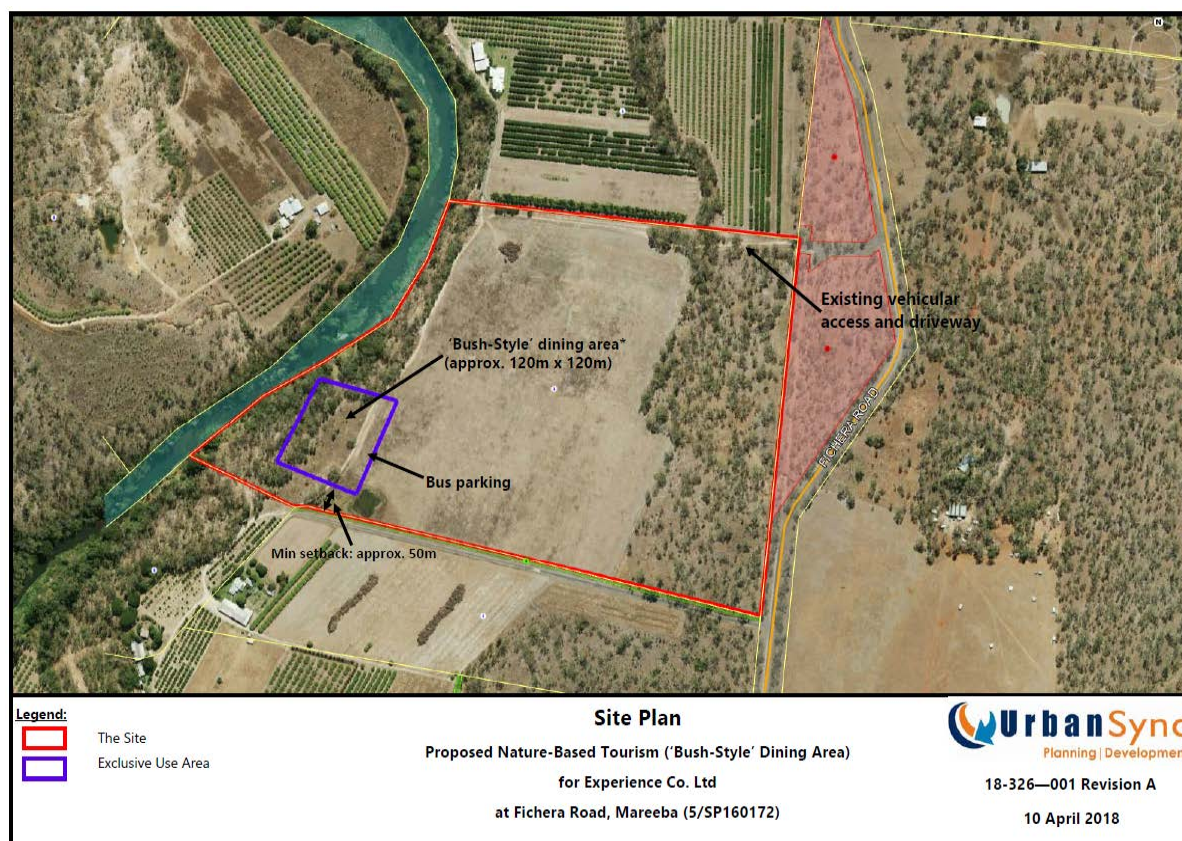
Site Plan – Proposed Nature-Based Tourism at Fichera Road, Mareeba.
